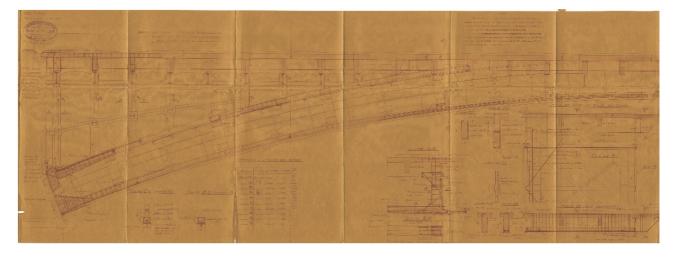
An original plan showing details of the viaduct reinforcements. (PLM, « Remaniement et renforcement du viaduc sur la Chiffa, 1/2 coupe longitudinale», (1932) (Box 96), Archive SNTF, Hussein Dey.
